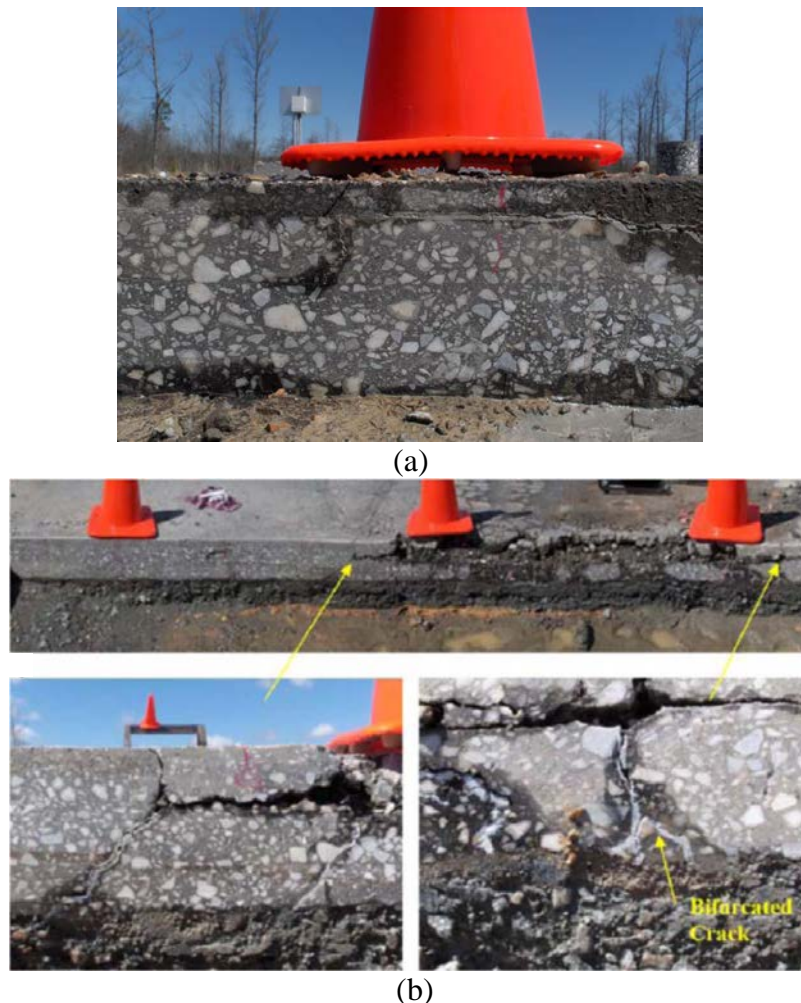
Pavement distresses due to bond failure (a) Delamination (b) Severe distresses due to the poor bond between two pavement layers (*Willis and Timm 2007*).
